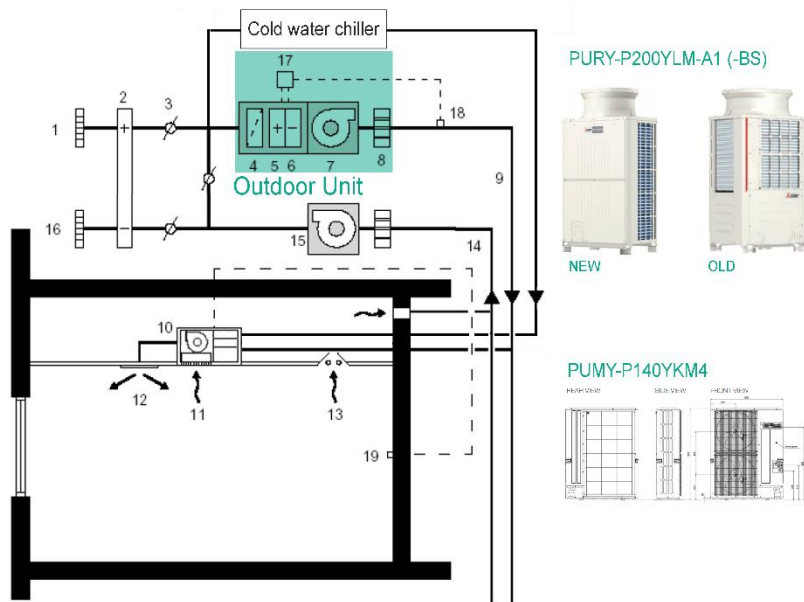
Detail of outdoor units from VRF ventilation system (by author).
